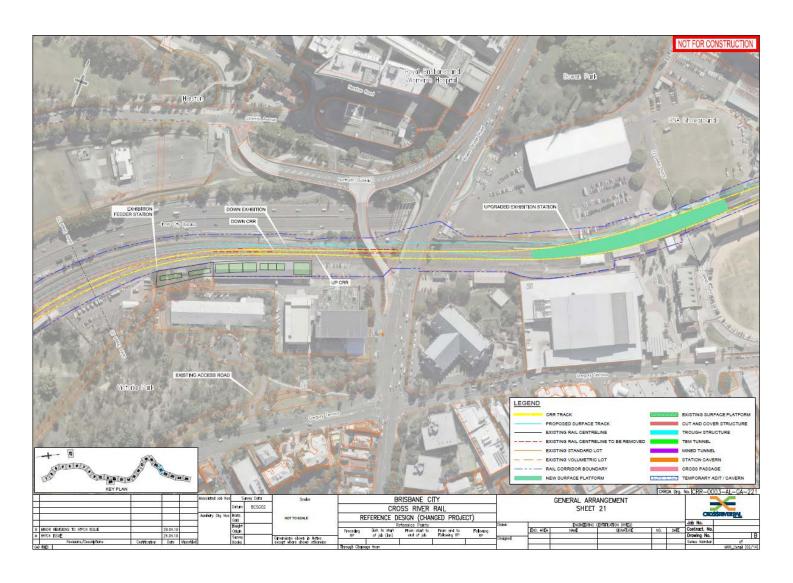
Project work at Exhibition Railway Station located within the existing rail corridor
